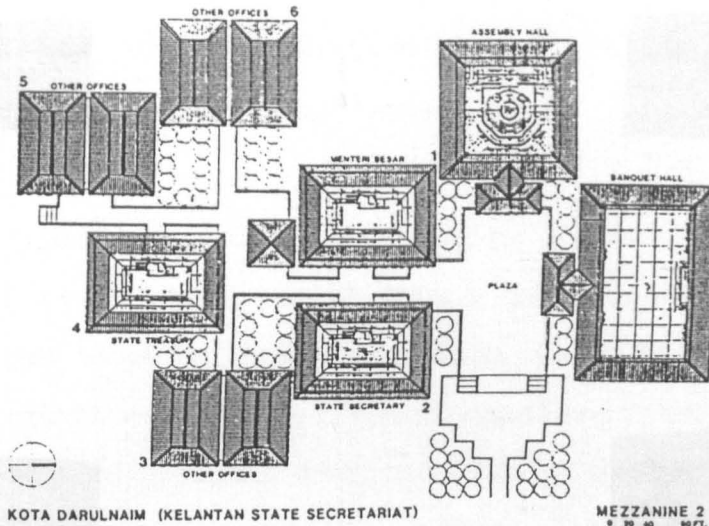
Mezzanine floor plan of 'Kota Darulnaim', Kelantan.⁵¹
